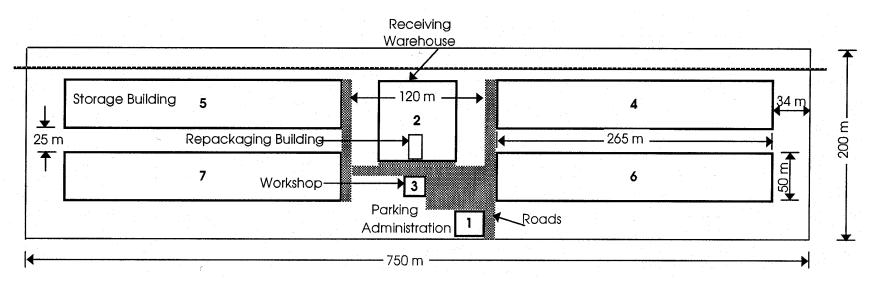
Site Layout of the Building Storage Facility — Uranium Metal, 50% Case
